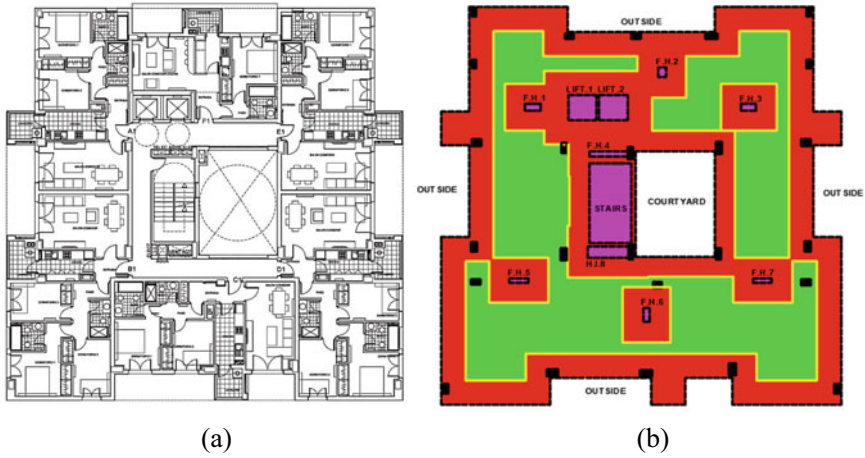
a Layout of the building floor plan; b Risk areas in the slab plant
